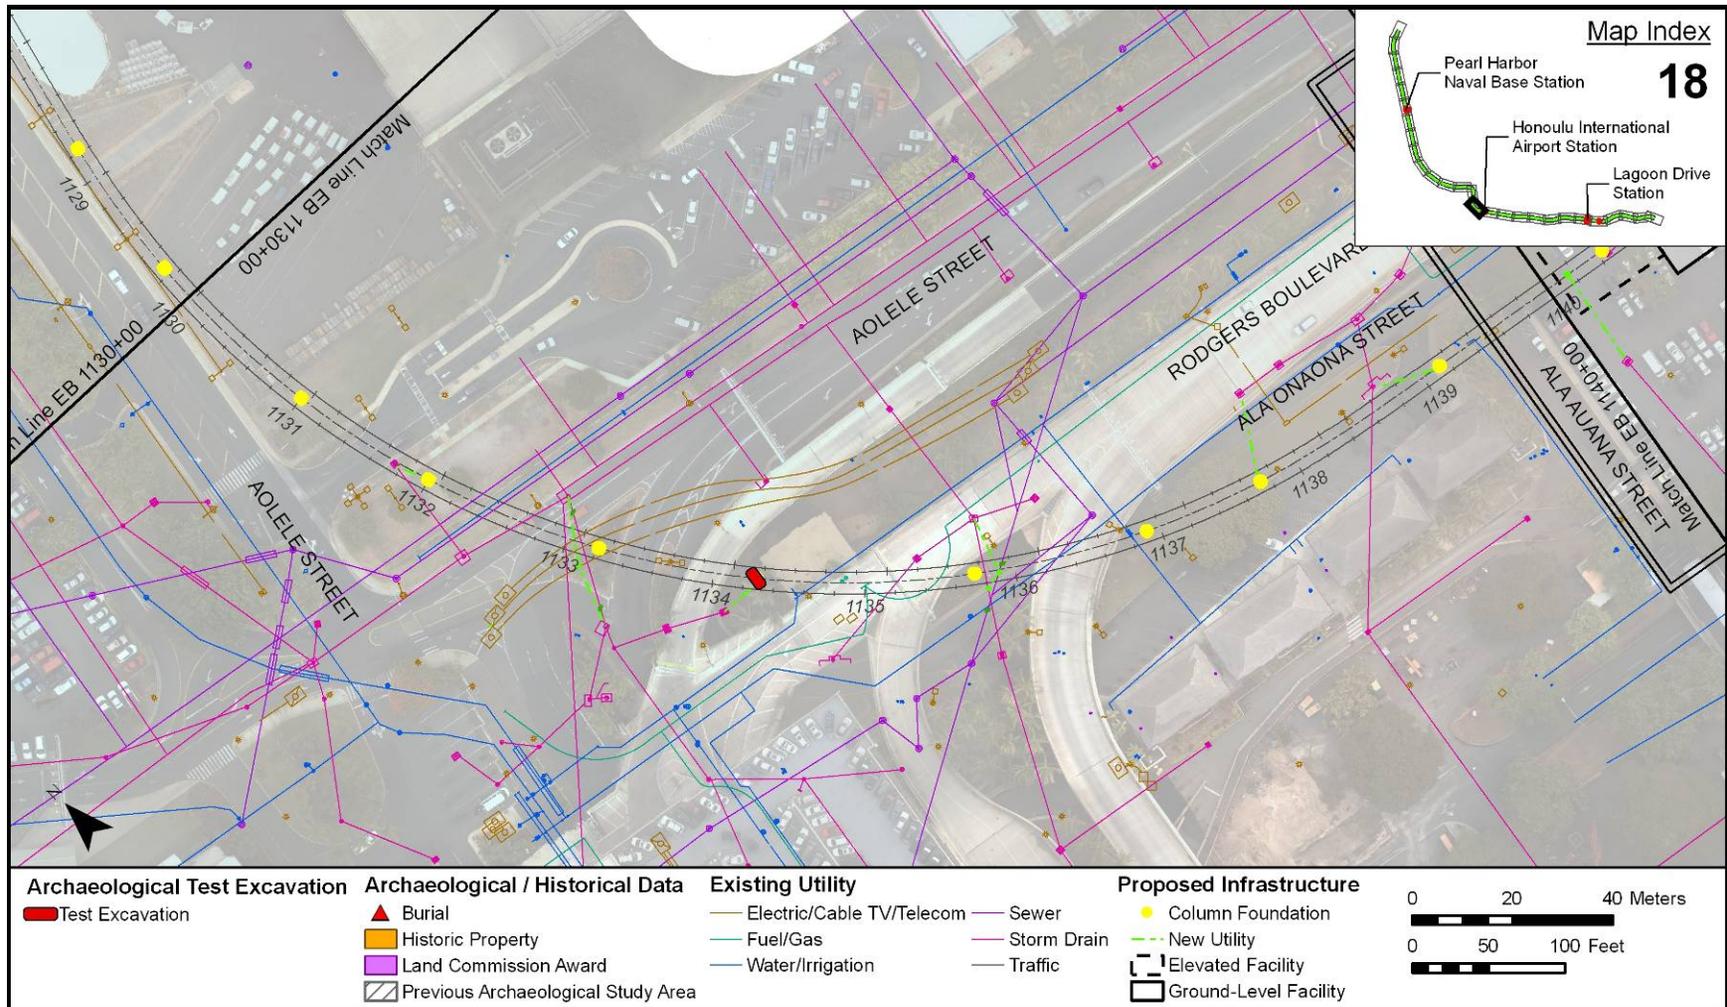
Map Sheet J 18, one 10x3 excavation at column foundation @ 1134+ 30
